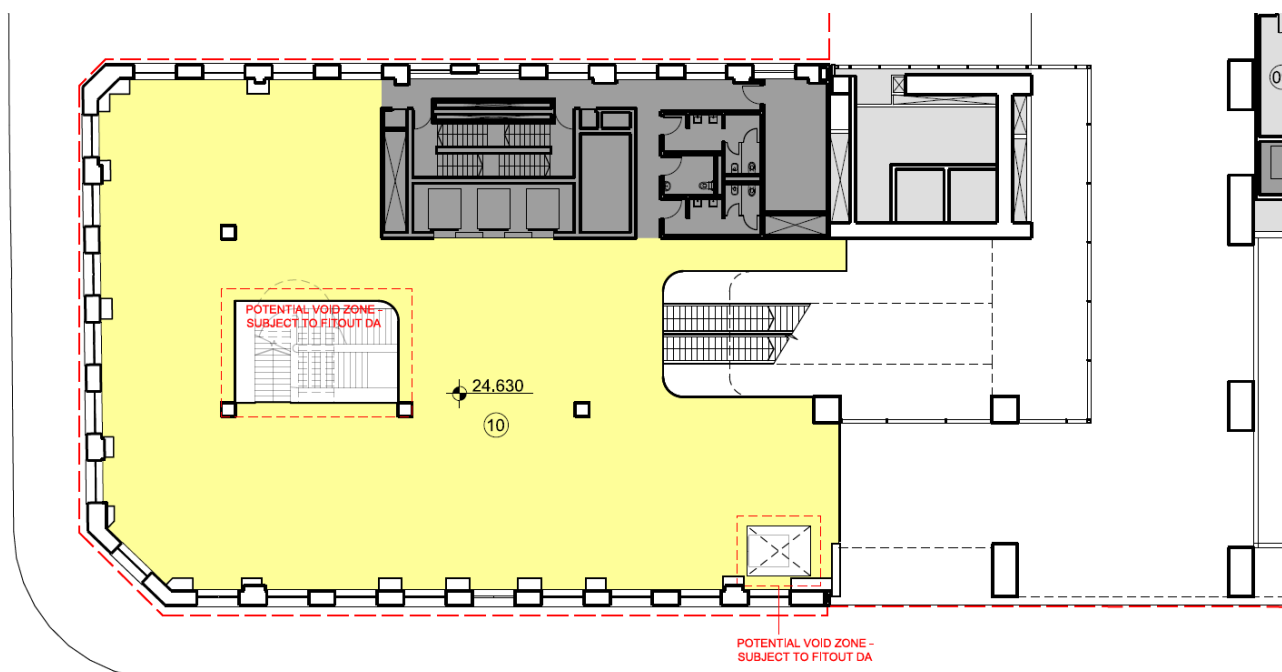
The Upper Ground level amended plan highlighting the potential void zones and as reflecting the Ground Floor Condition B40(a) and (c) layout
